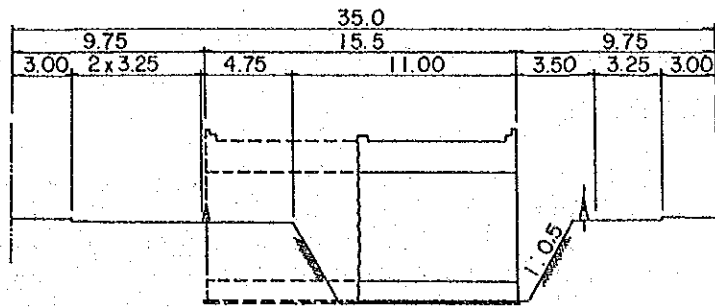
TEMPORARY CROSS SECTION OF E. AYALA AVENUE FOR CONSTRUCTION OF VIADUCTS
